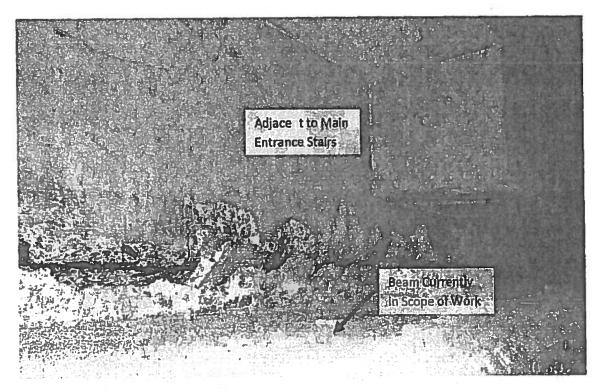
Item #1- Bottom of Library Wall spall damage located under Library Main Entrance Stairs
